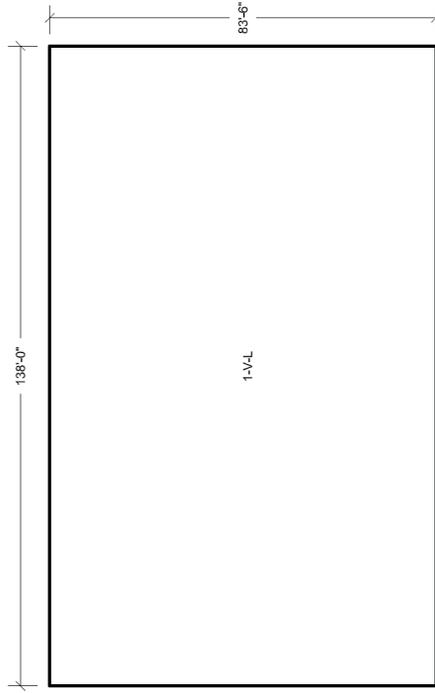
H.6-98: LHS BASIN EAST WALL LOOKING WEST
